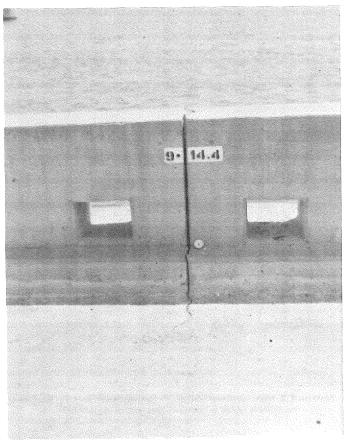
Opening in north parapet wall at Station 9+14.4, May 16, 1955.
